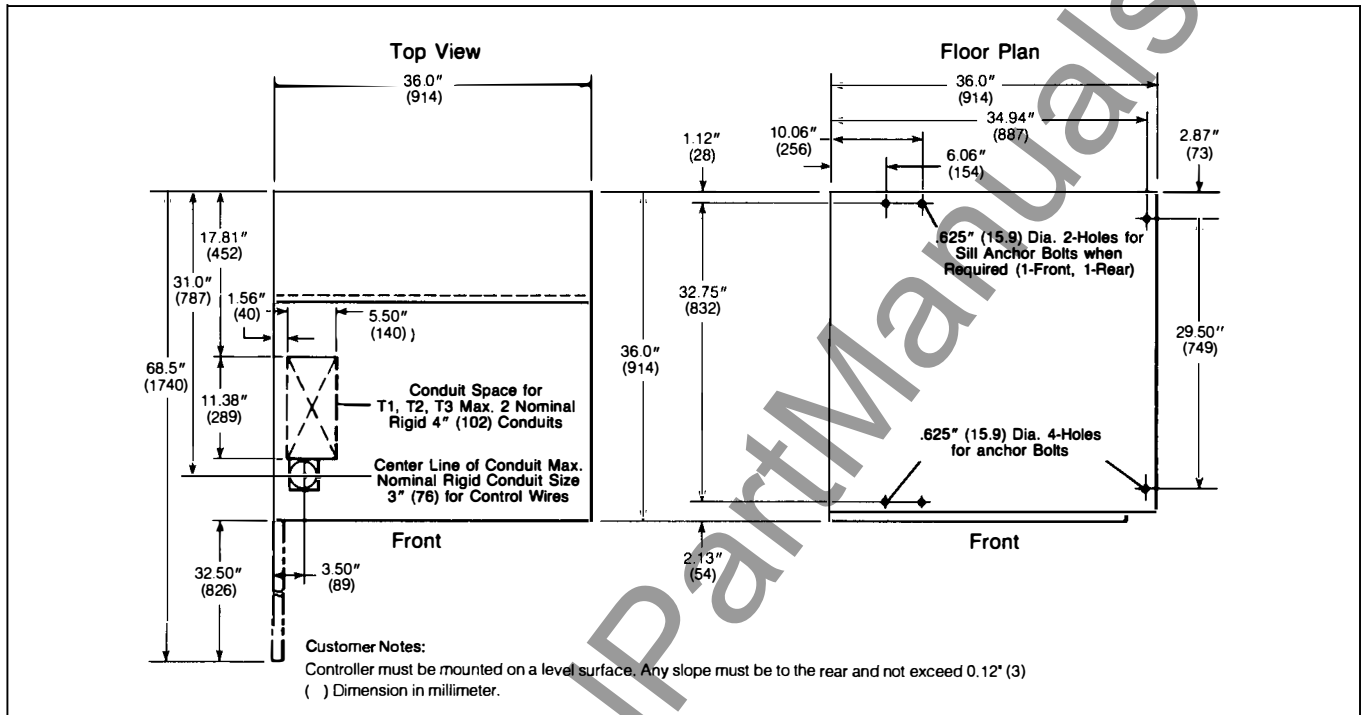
Anchor Bolt and Conduit Entry Locations—Top Entry of Load Cables
